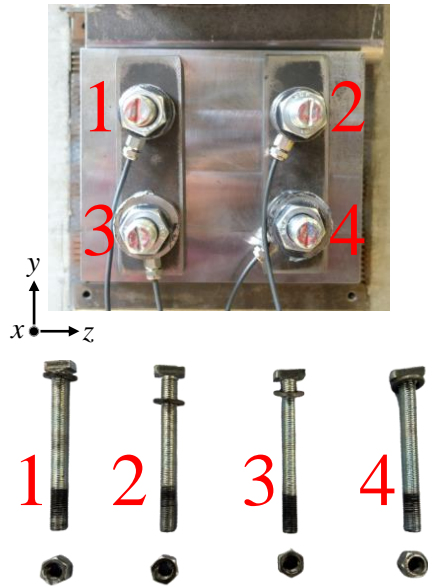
After test conditions of the saw-tooth surfaces / CC-03.
